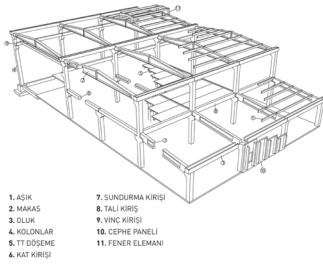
Sample Reinforced Concrete Prefabricated System Model
